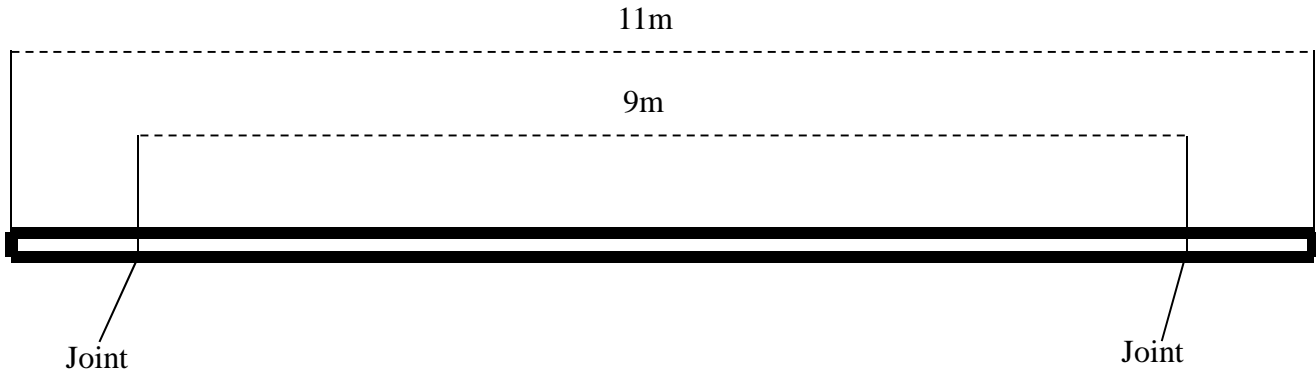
Concrete strip with 9 m spacing between saw cut joints
